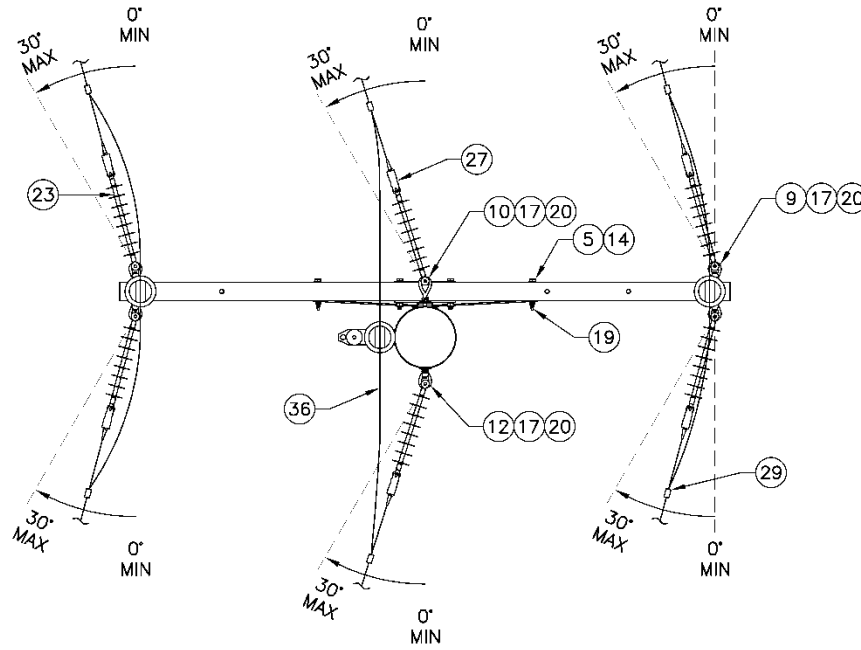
Three-Phase #4 AWG Copper Double Deadend Pole Top Assembly
